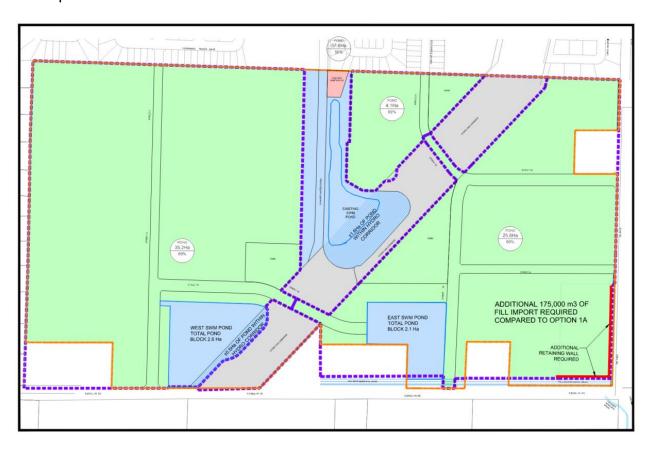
Option 1B - Two New SWM Ponds (East Pond on Davidson Parcel)
